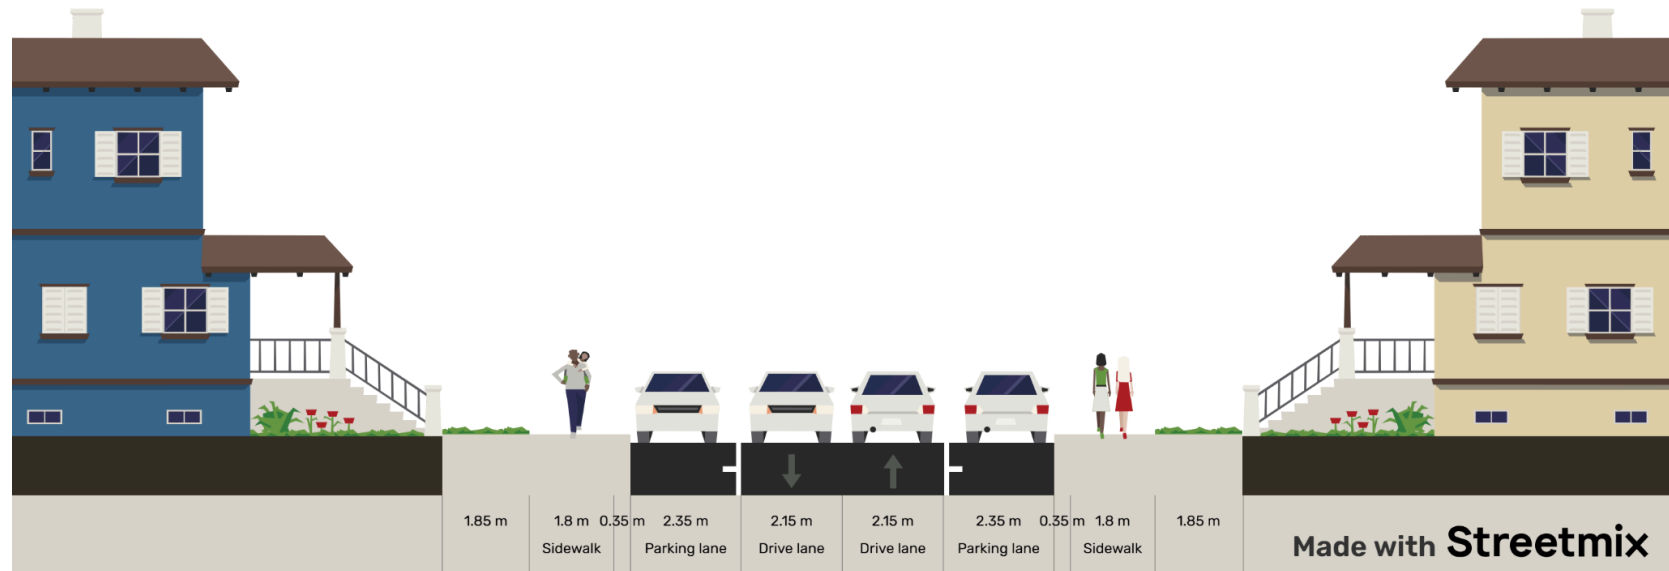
Local Road Option 1 - 17m ROW, 8m Road with 1.8m Boulevard walks
